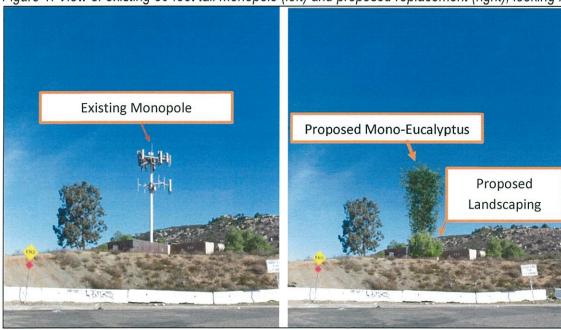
View of existing 50-foot tall monopole (left) and proposed replacement (right), looking west
